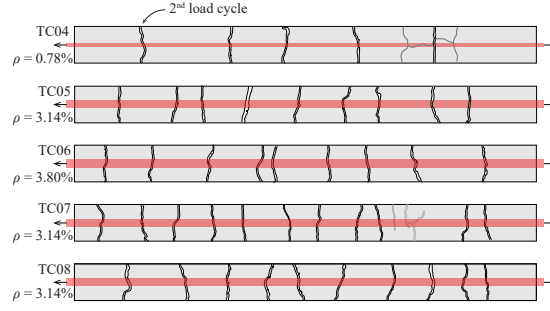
Tensile tests: cracking patterns of tested specimens (cracks in light grey developed after all load cycles, during monotonic loading up to failure; for specimens with eccentric bars, the surface on the bar’s side is shown)
